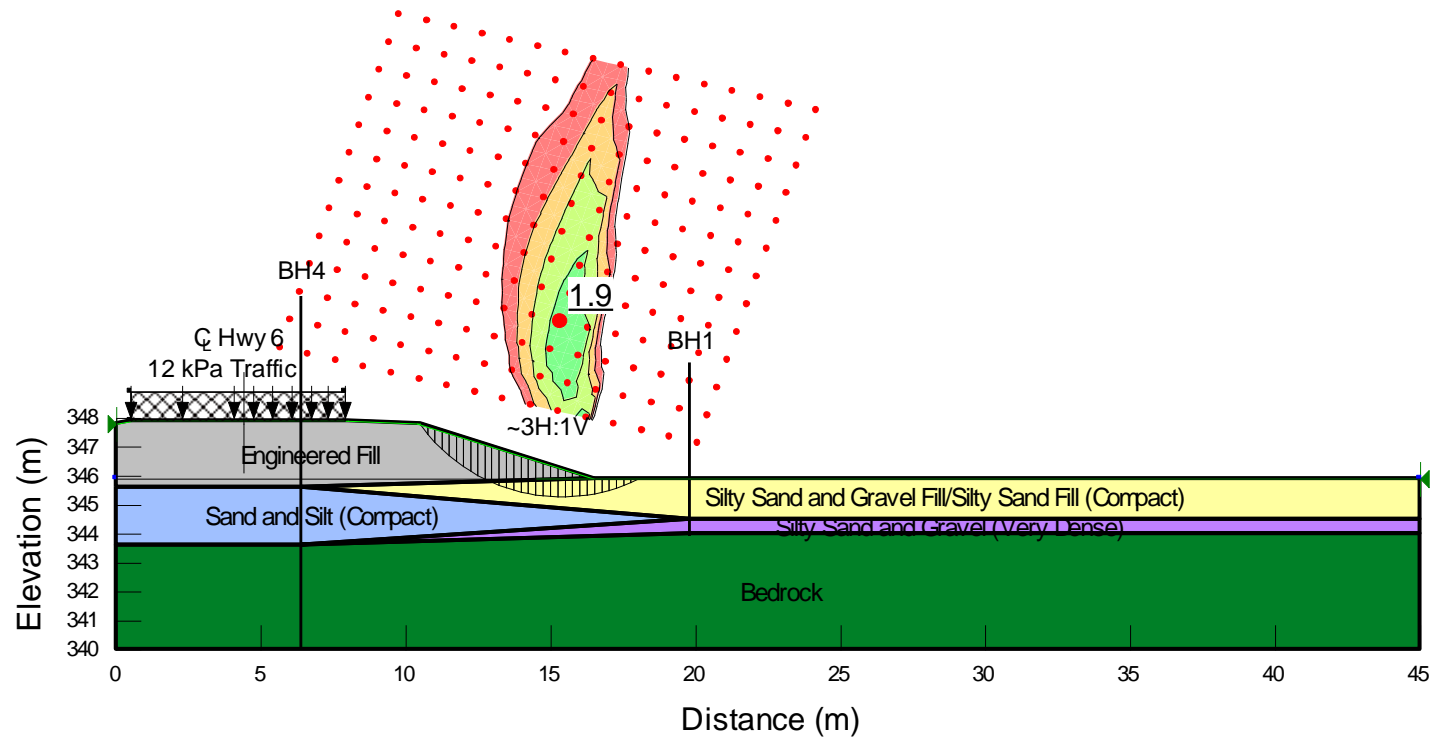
Slope stability analysis for embankment slope after culvert replacement with 3H:1V slope – drained static conditions
